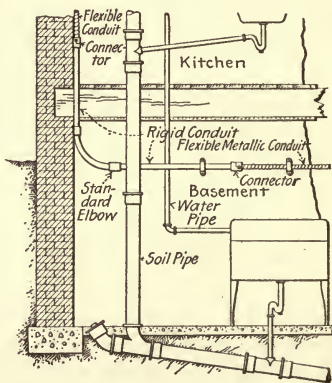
Rigid conduit inserted where conduit is exposed to moisture.
